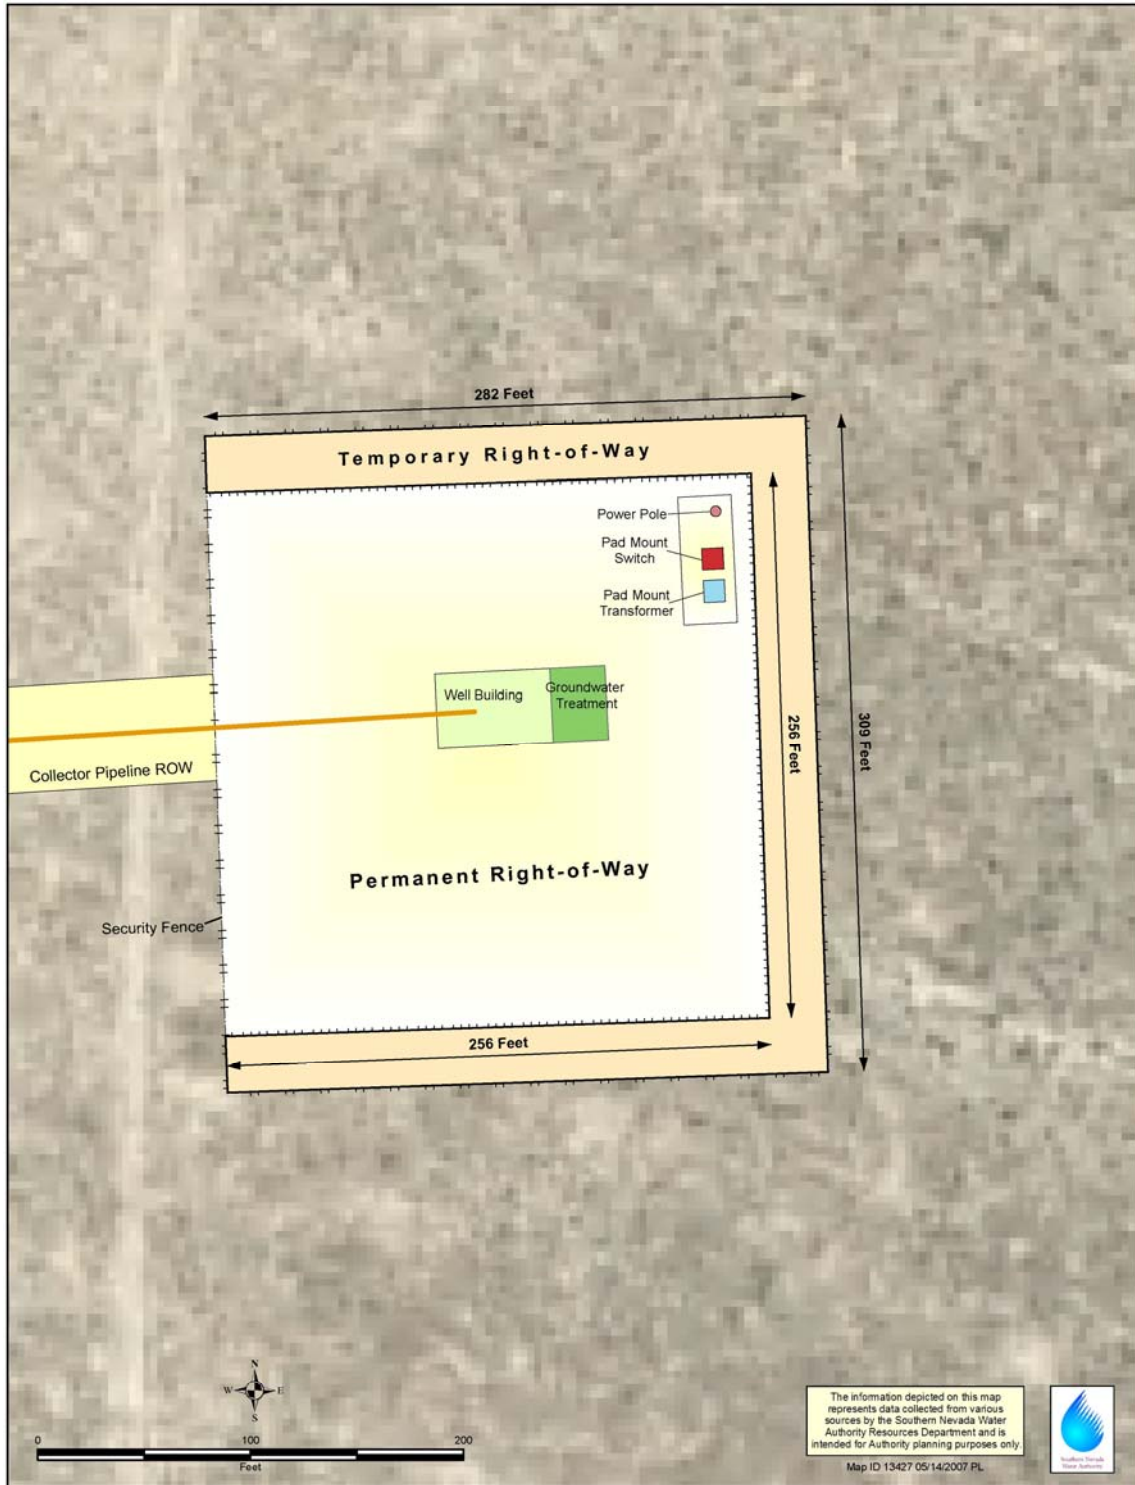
Preliminary Aboveground Well Housing Site Layout
